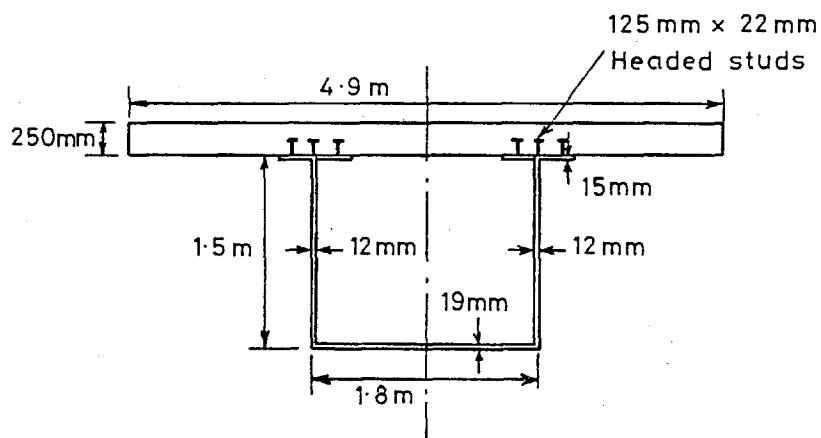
Cross-section of typical open composite box girder (simplified)
